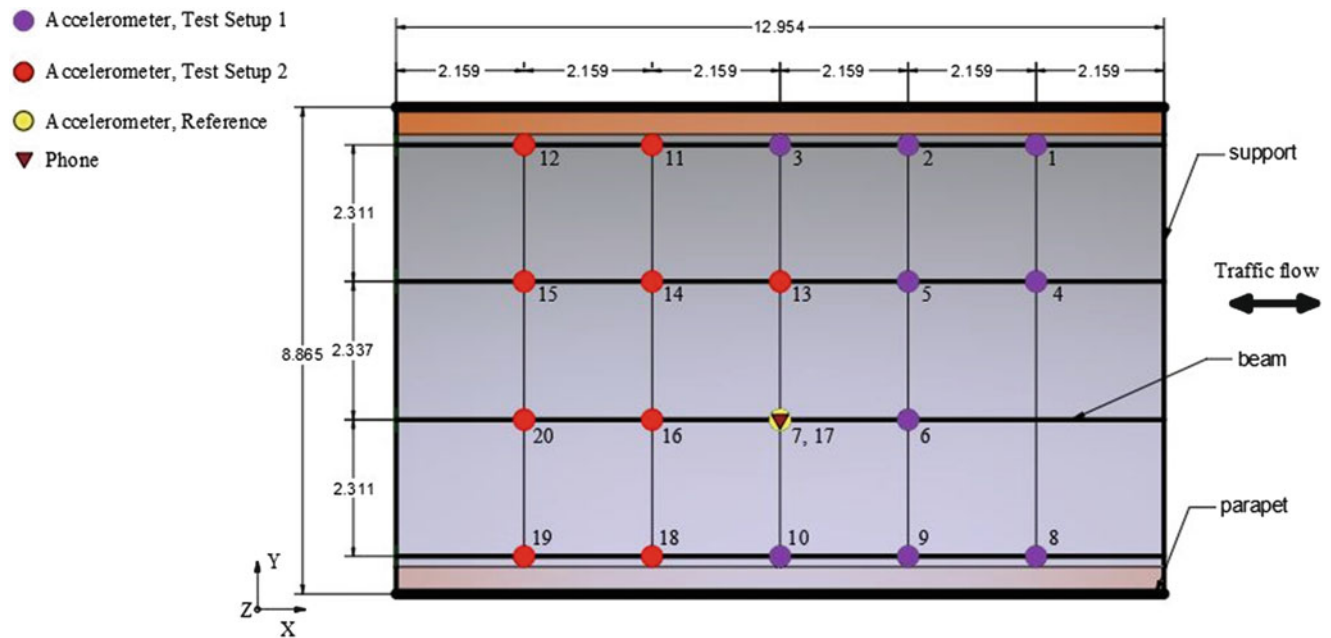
Sensor instrumentation plan for one of the T-beam bridge span with two setups (all dimensions are in meters)
